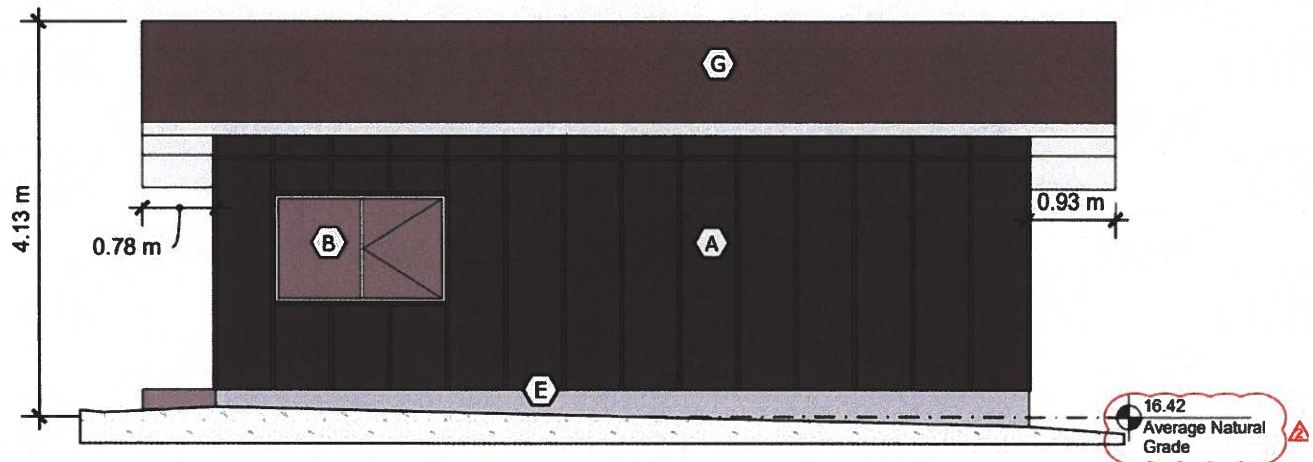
North Elevation (from plans by House Behind the Hedge Design Build)
